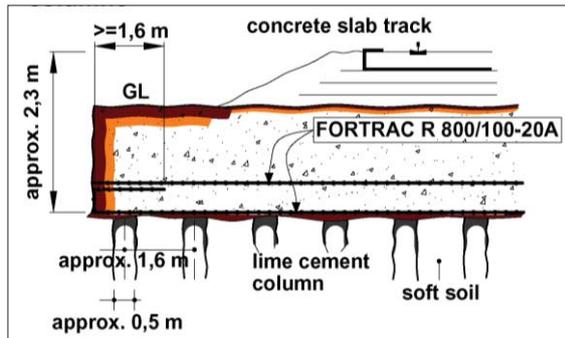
Typical cross section with 2 x Fortrac® 800 A on cemented stone columns for the ICE route at Körgraben.
